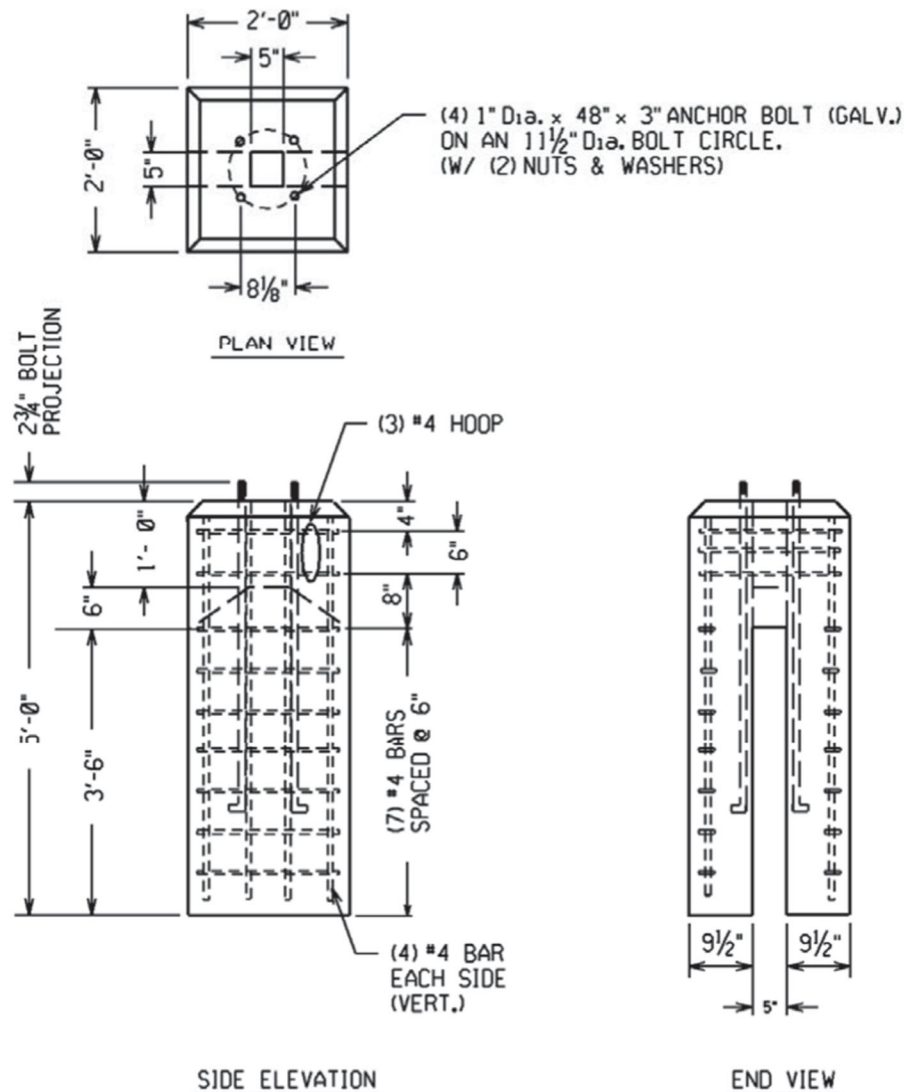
Precast Concrete Street Lighting Foundation - 11½" Bolt Circle
